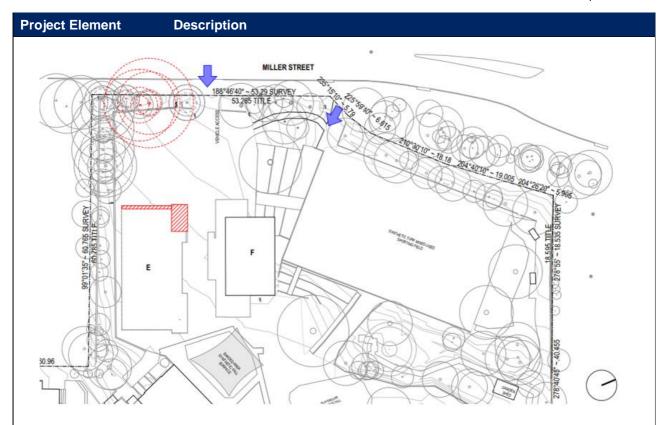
Demolition plan – north-western section of site (Source: Fulton Trotter Architects)
